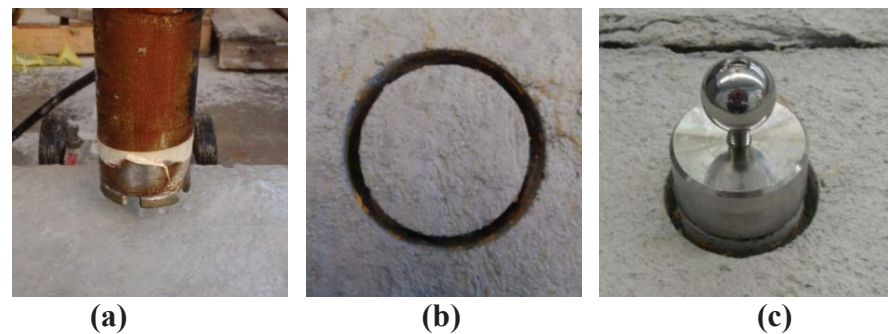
Bond Test a) Drilling Instrument b) Circular Cut c) Bonded Steel Disk
